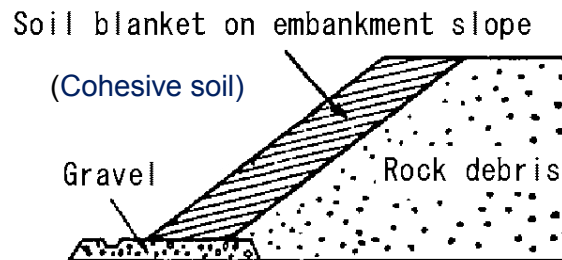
OVERLAYS BY SOIL BLANKET ON EMBANKMENT SLOPE
